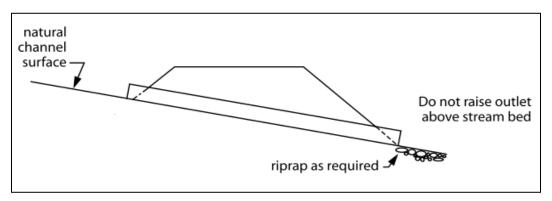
Typical Vertical Culvert Placement in Natural Watercourse
